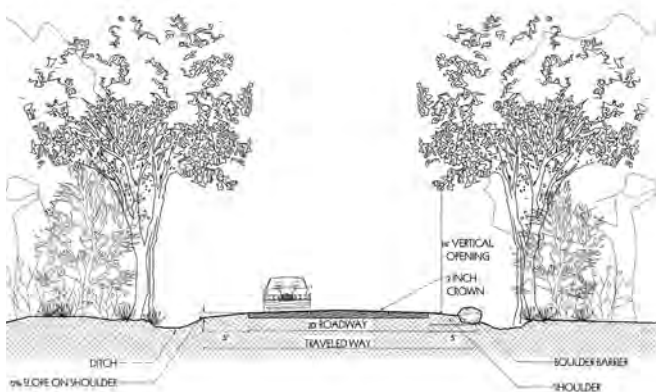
Typical road cross-section for management. Vegetation growing close to the road edge is a character-defining aspect of the road and should be preserved.
